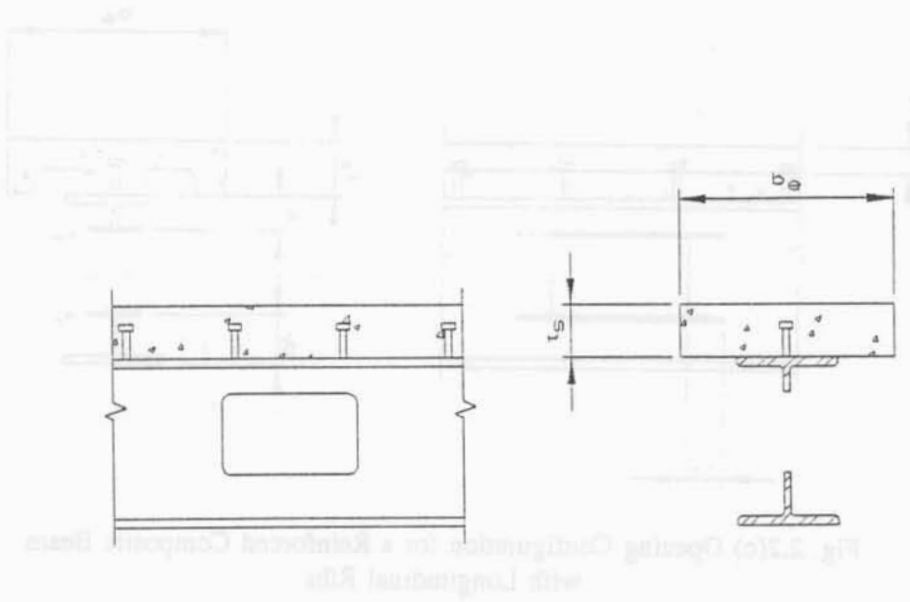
(a) Opening Configuration for an Unreinforced Composite Beam with a Solid Slab
